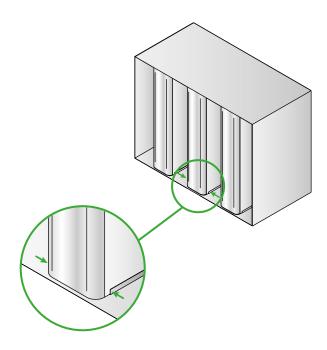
Secure the splitters to the mounting rails with sheet metal screws or pop rivets.
